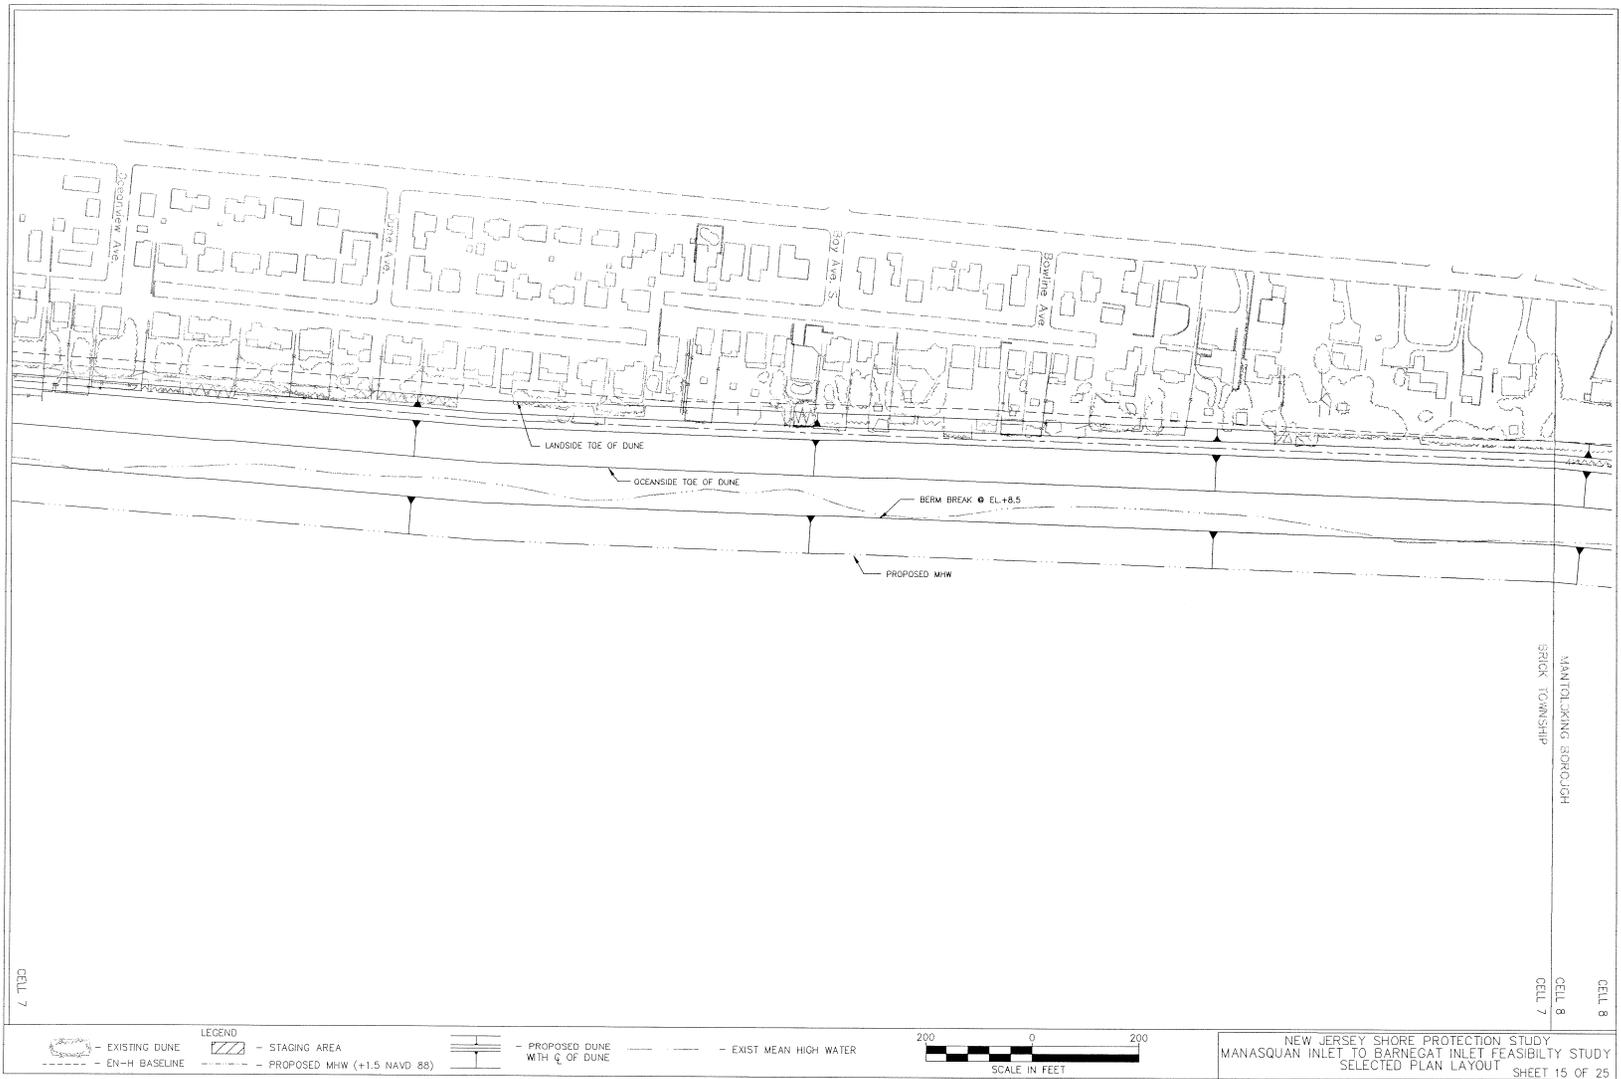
Selected Plan Layout – Brick Township, South Mantoloking Beach to Mantoloking Borough
